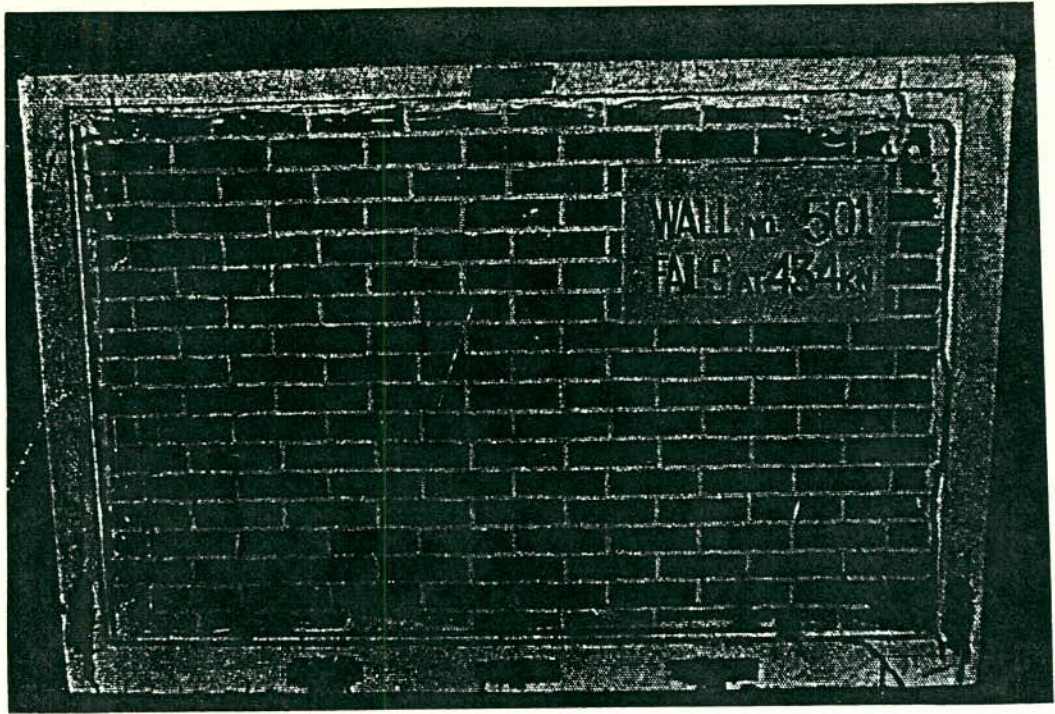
(b) Failure of Wall-beam Panel (with frame).
